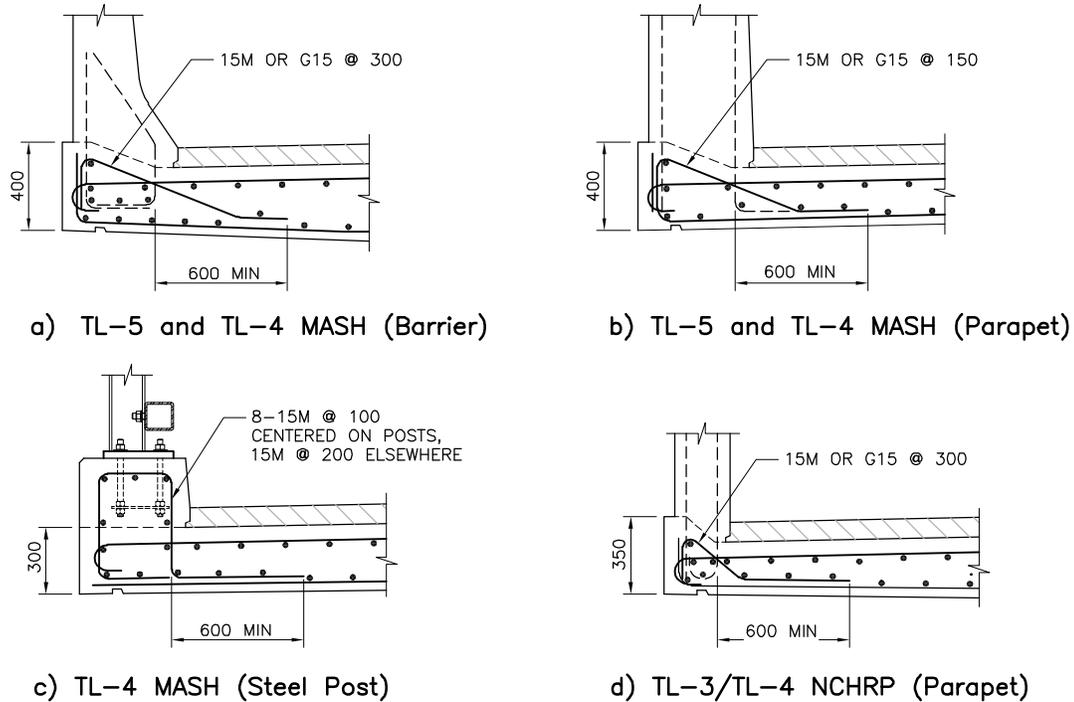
Typical Reinforcing Steel Anchorage Details at Transverse Deck Slab Cantilever Overhang to Barrier Connection
